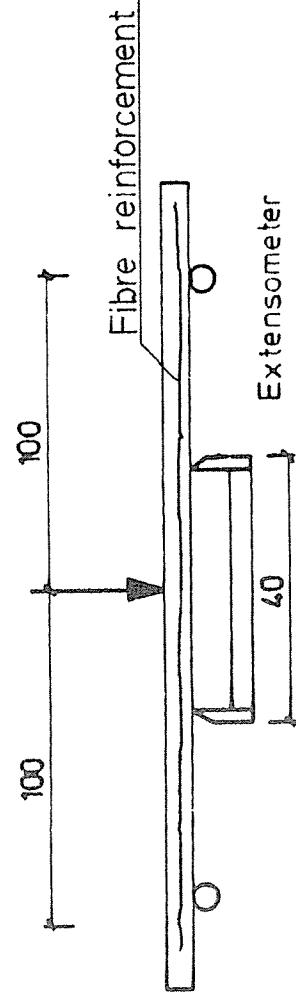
Load set-up when bending natural sisal fibre concrete beams.
